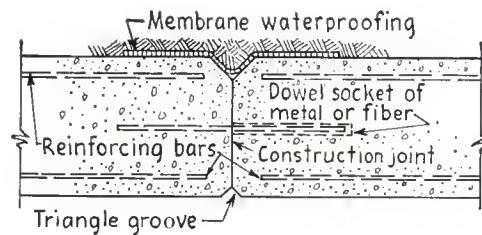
Horizontal section of vertical construction joint sometimes used in bridge abutments and retaining walls. The dowels are bonded to the concrete on one side only.
